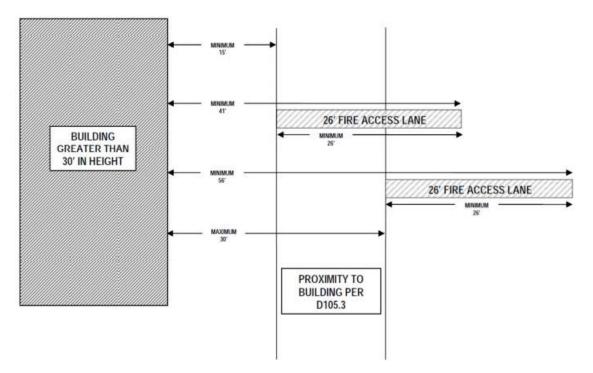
Standard Aerial Fire Apparatus Access Road for Buildings Greater than 30 Feet in Height. Source: Town of Brighton, New York.
